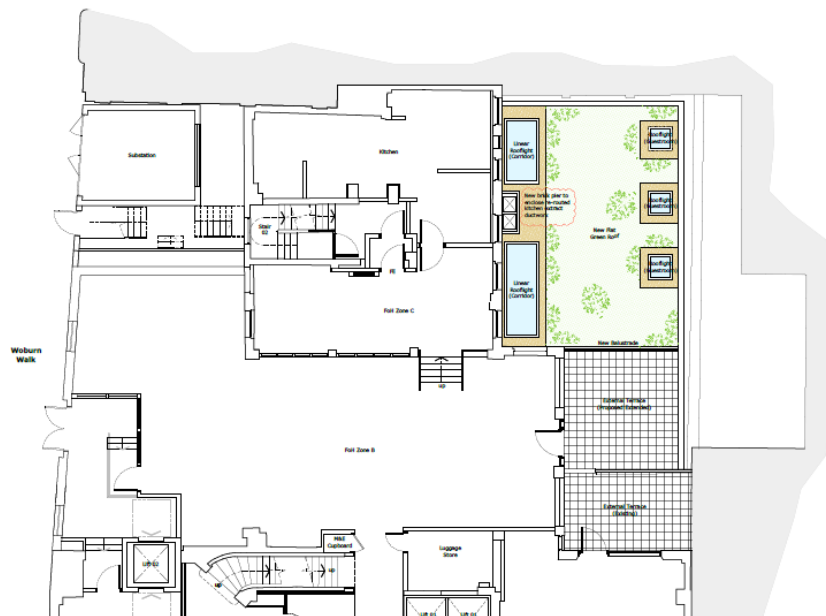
rear of site at ground floor showing existing and proposed terraces adjacent to the new (inaccessible) green roof
